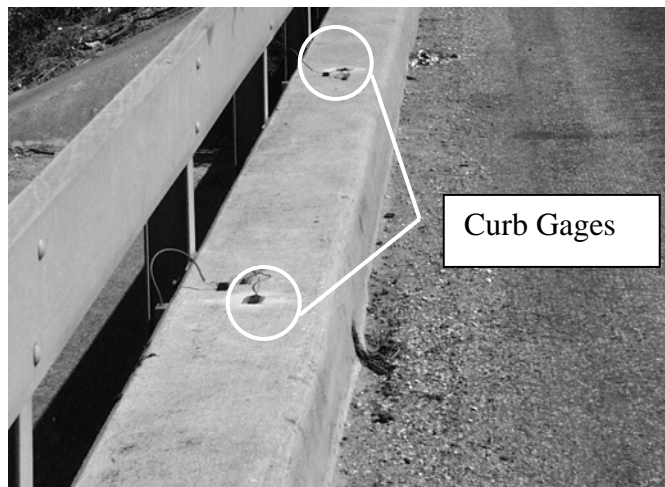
Strain Gage Locations – Wimberley Bridge – Span 1
